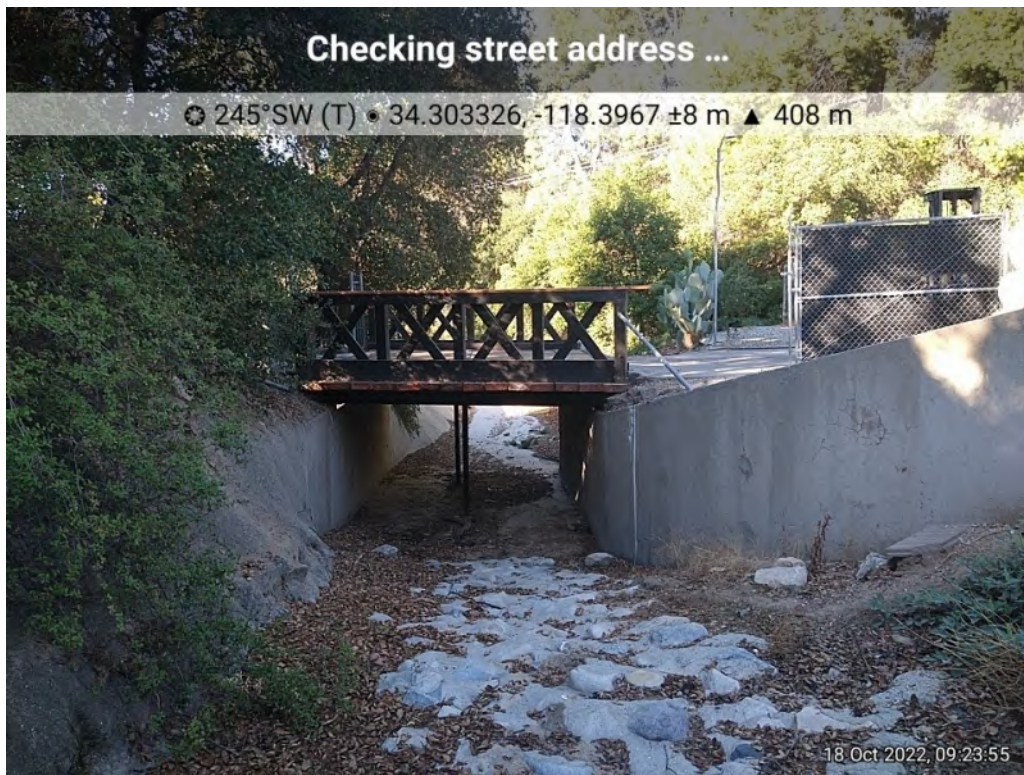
Depicts the bridge over the concrete channel that will be replaced.
